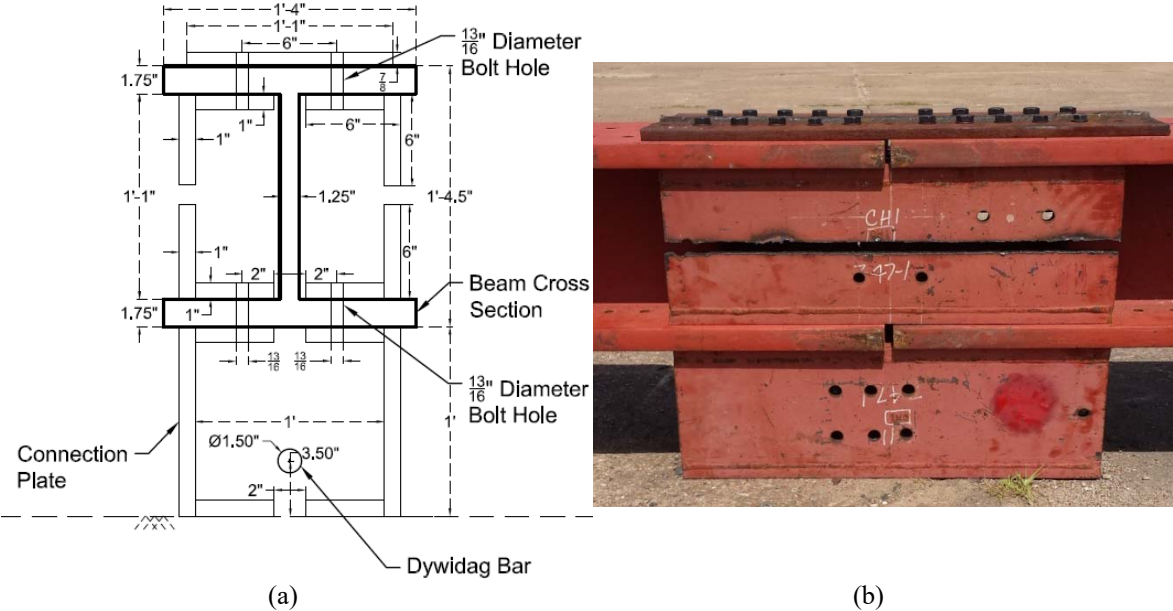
(a) Complete cross section of the connection; (b) profile view of constructed connection
